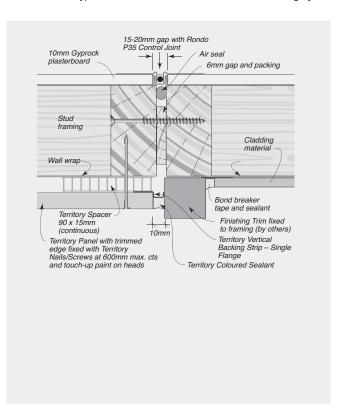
Typical Junction Detail with Fibre Cement Cladding System
